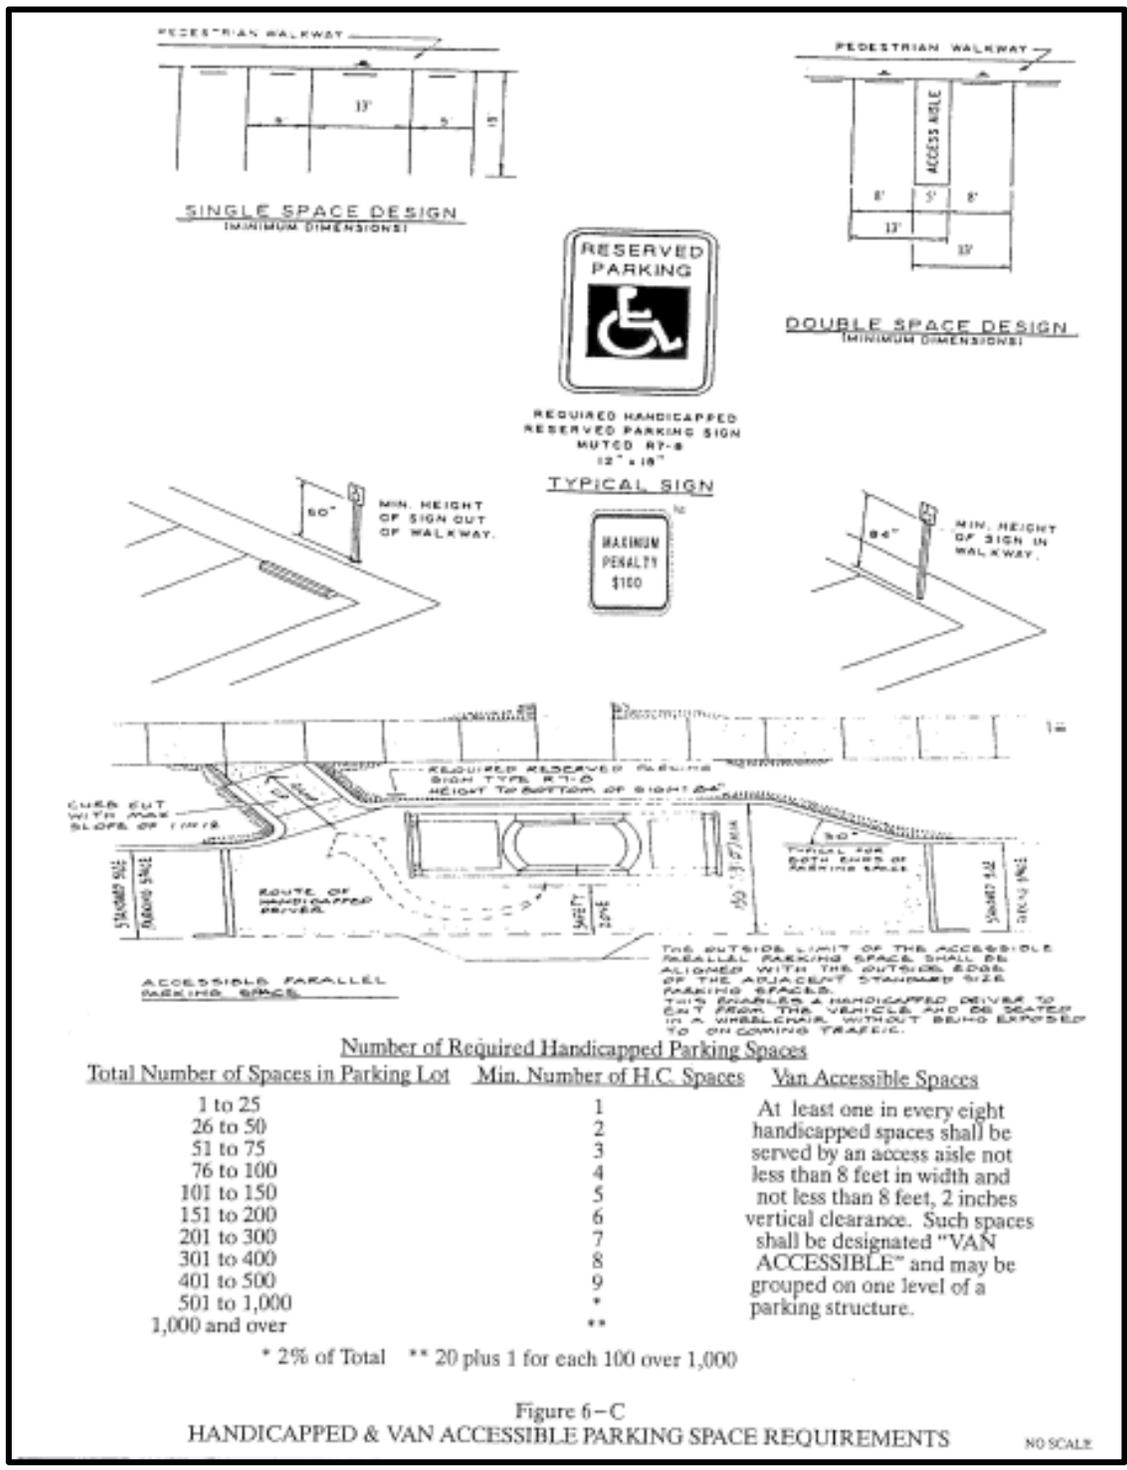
C: Handicapped & Van Accessible Parking Space Requirements
